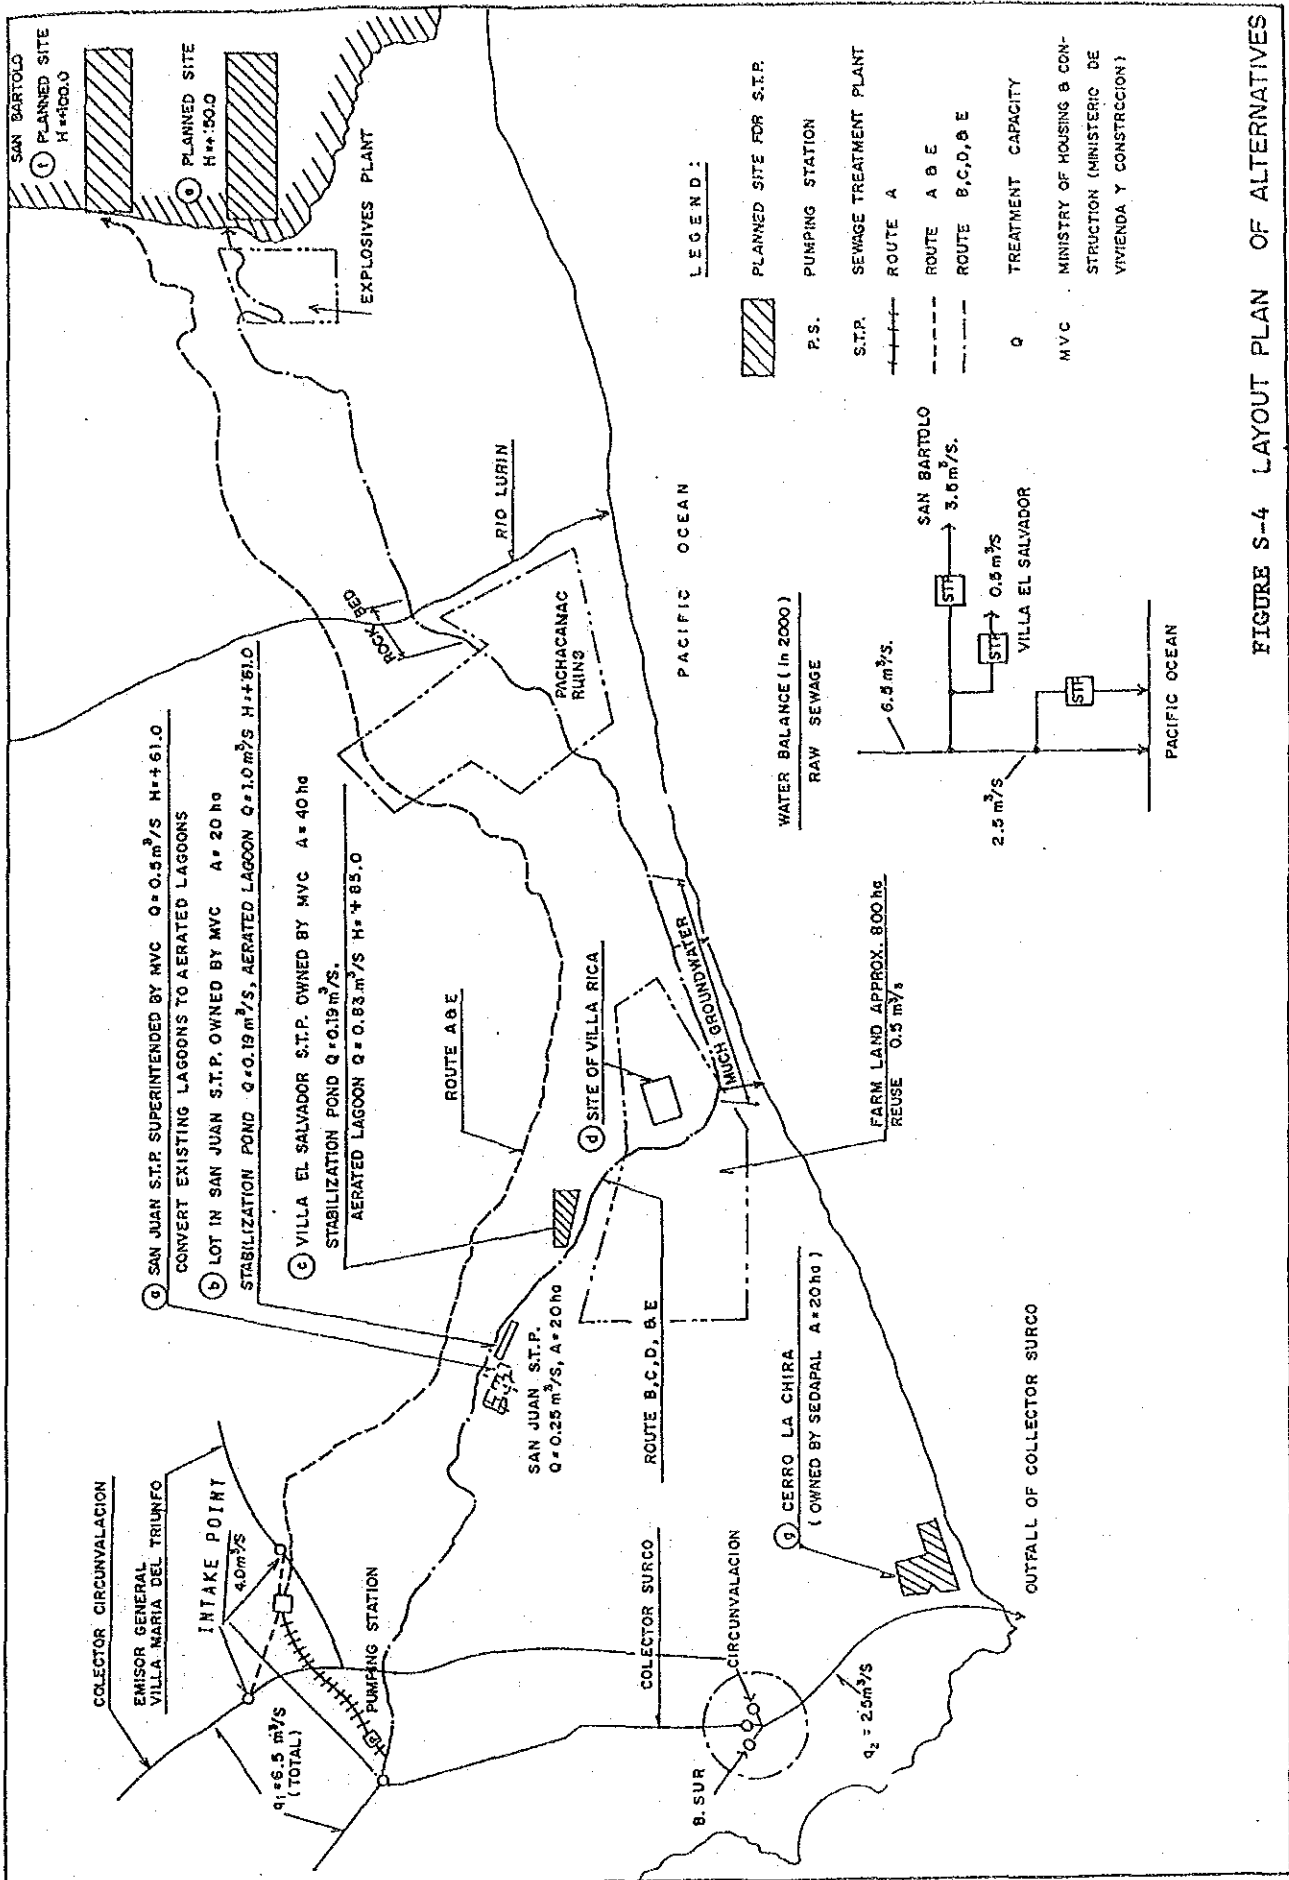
LAYOUT PLAN OF ALTERNATIVES
